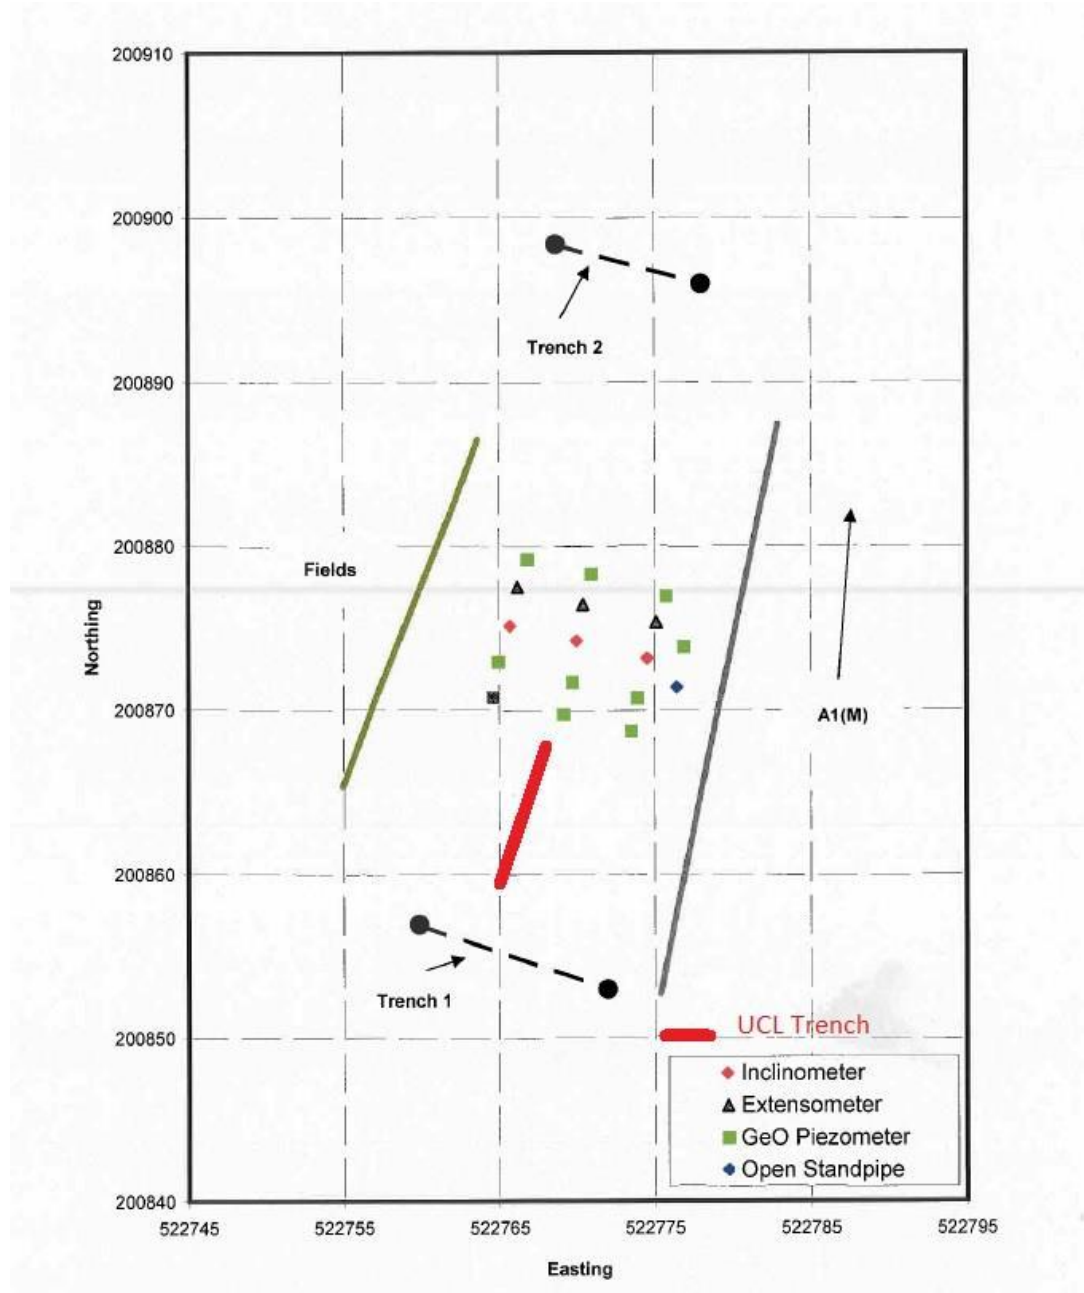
Instrumentation location plan indicating location of inspection trenches
